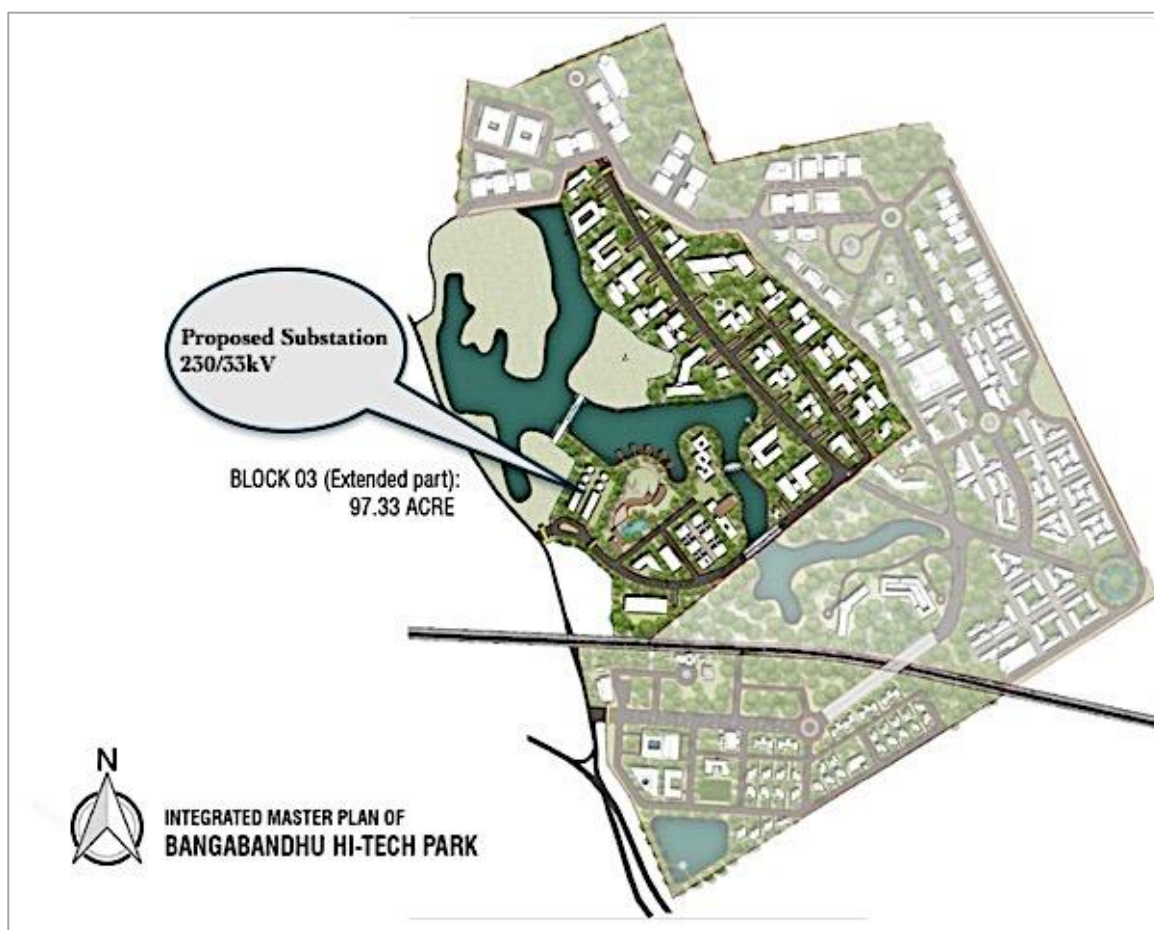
Integrated Master Plan Layout of BHTC, Block-3 and location of proposed SS
